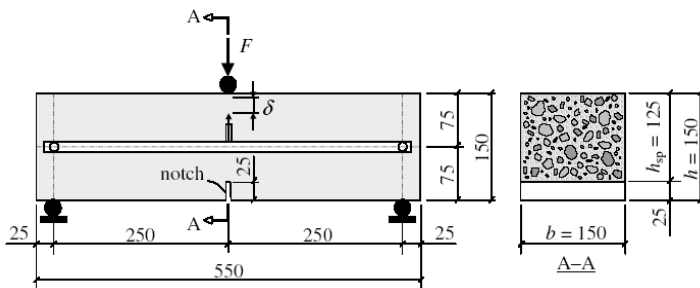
Pre-notched beam geometry and 3-point bending test set-up [14]
